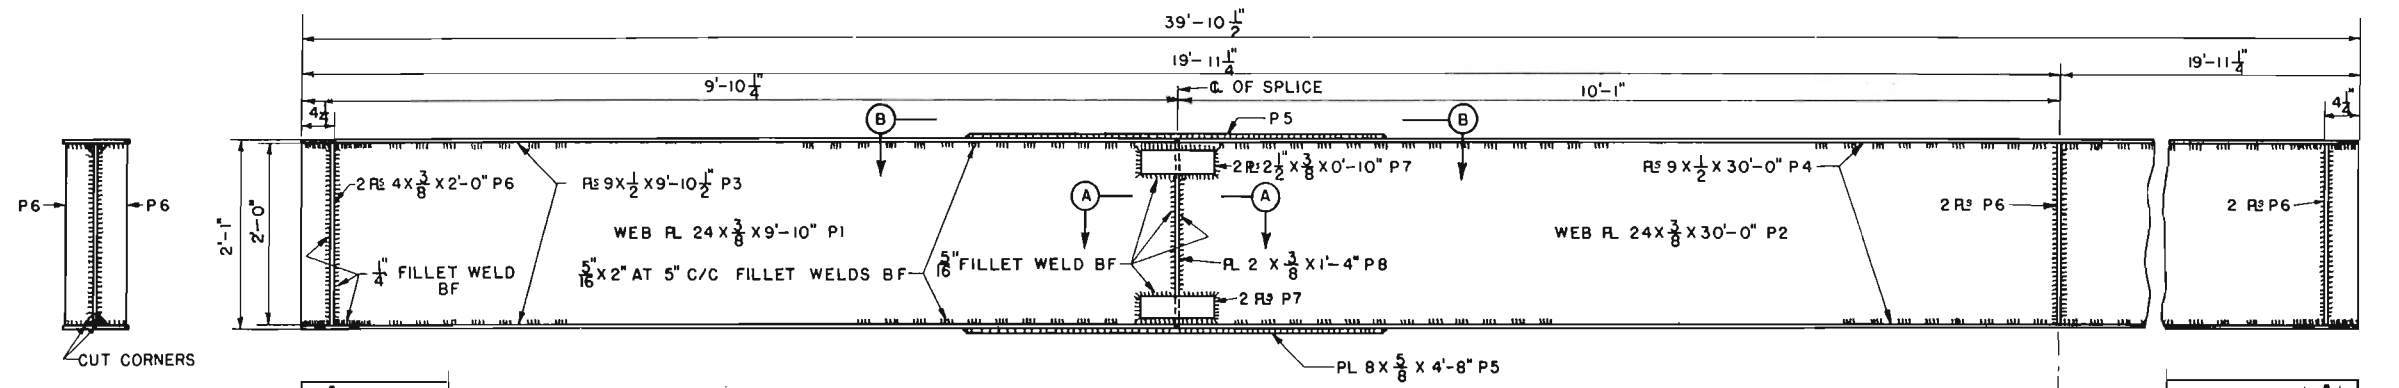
PLATE GIRDER REPLACING 21 I 63 40' SPAN
